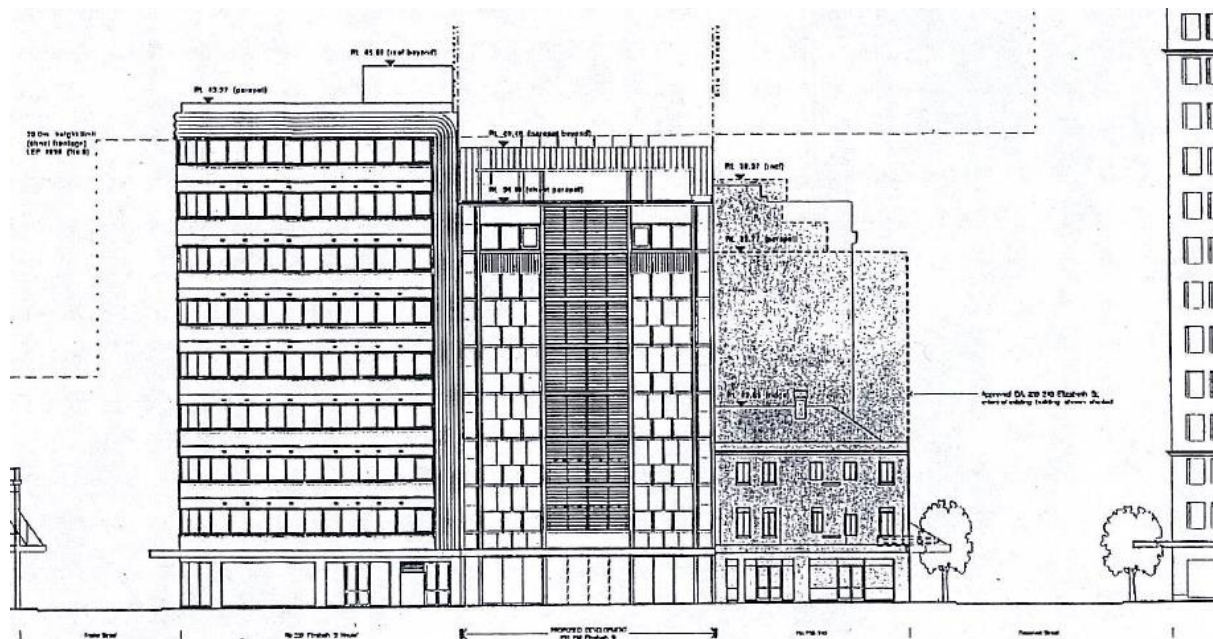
D/01/00140 streetscape elevation (Jahn Associates Architects)
